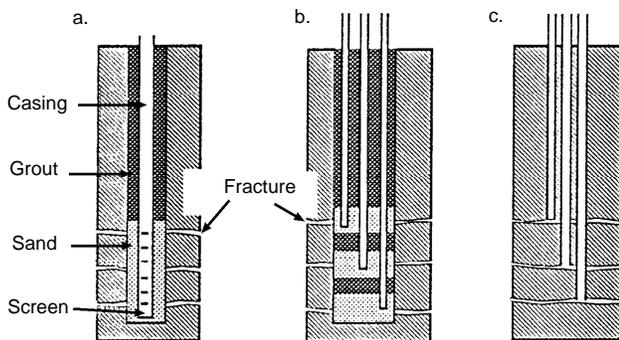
Methods of completing wells with induced fractures: a) screen across all fractures b) casing to each fracture, and c) driven casing to each fracture.
